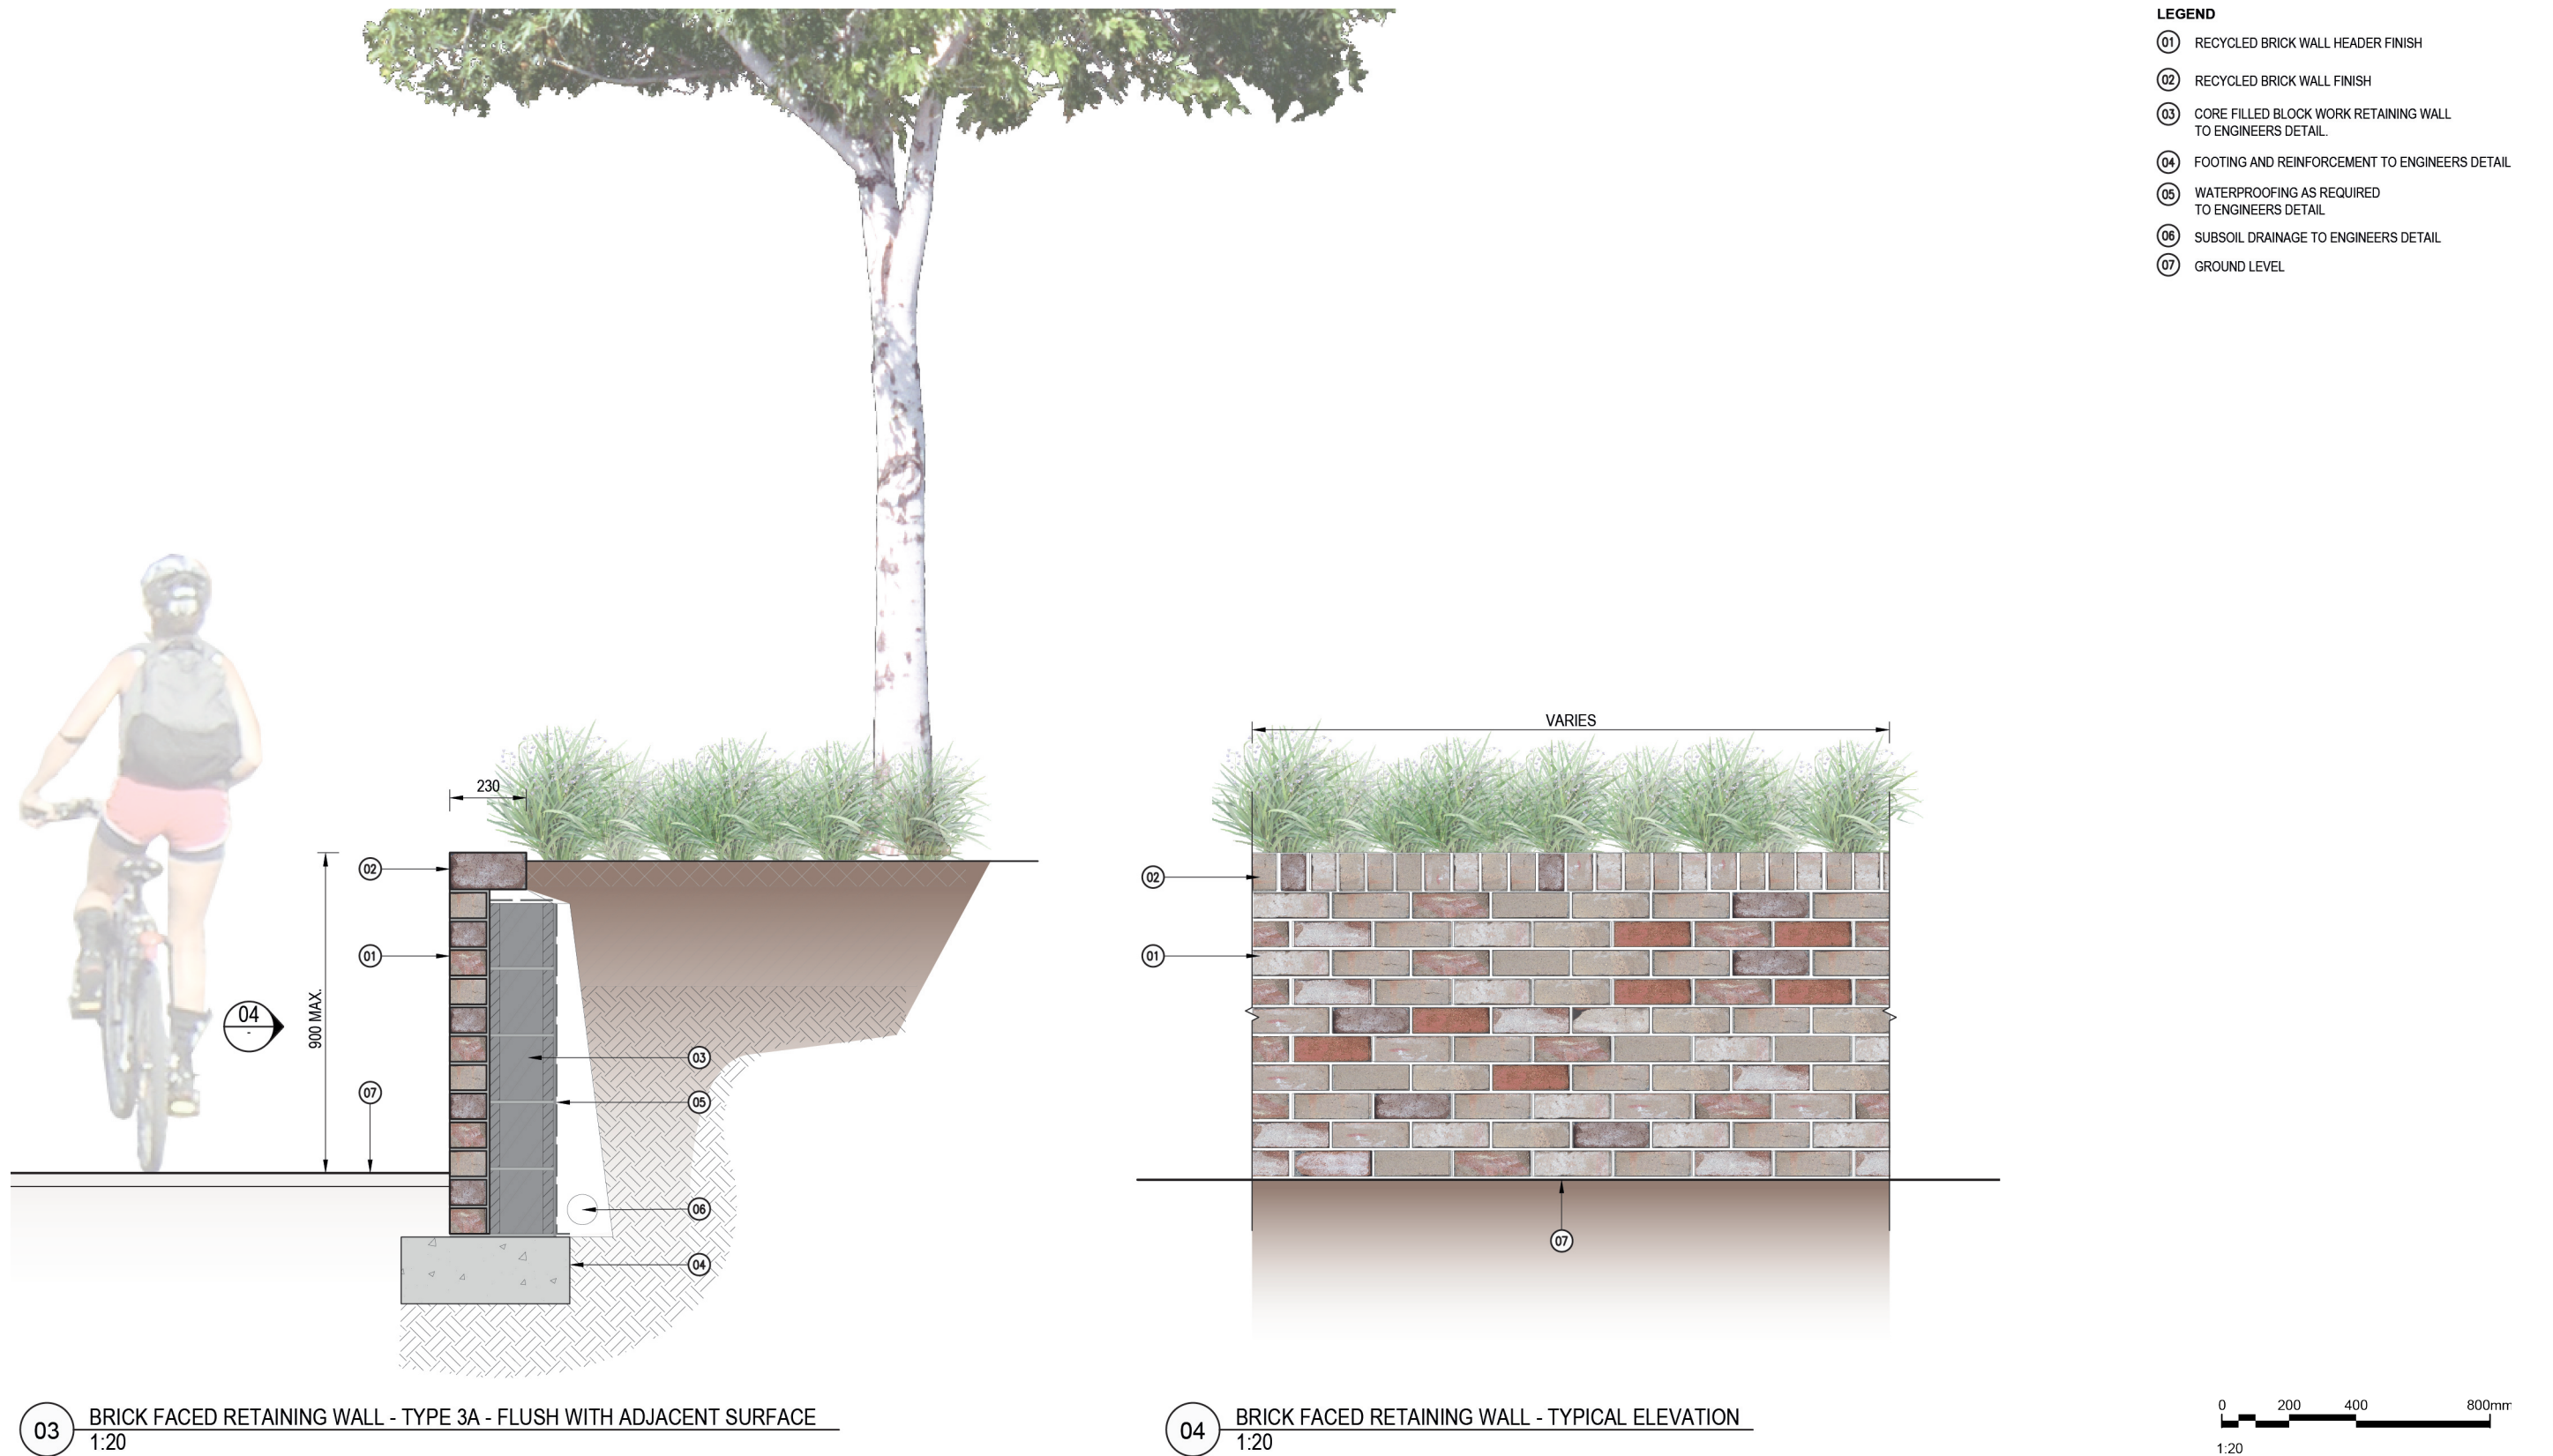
Campbell Street Green Link - Retaining walls - Sheet 02 of 02
